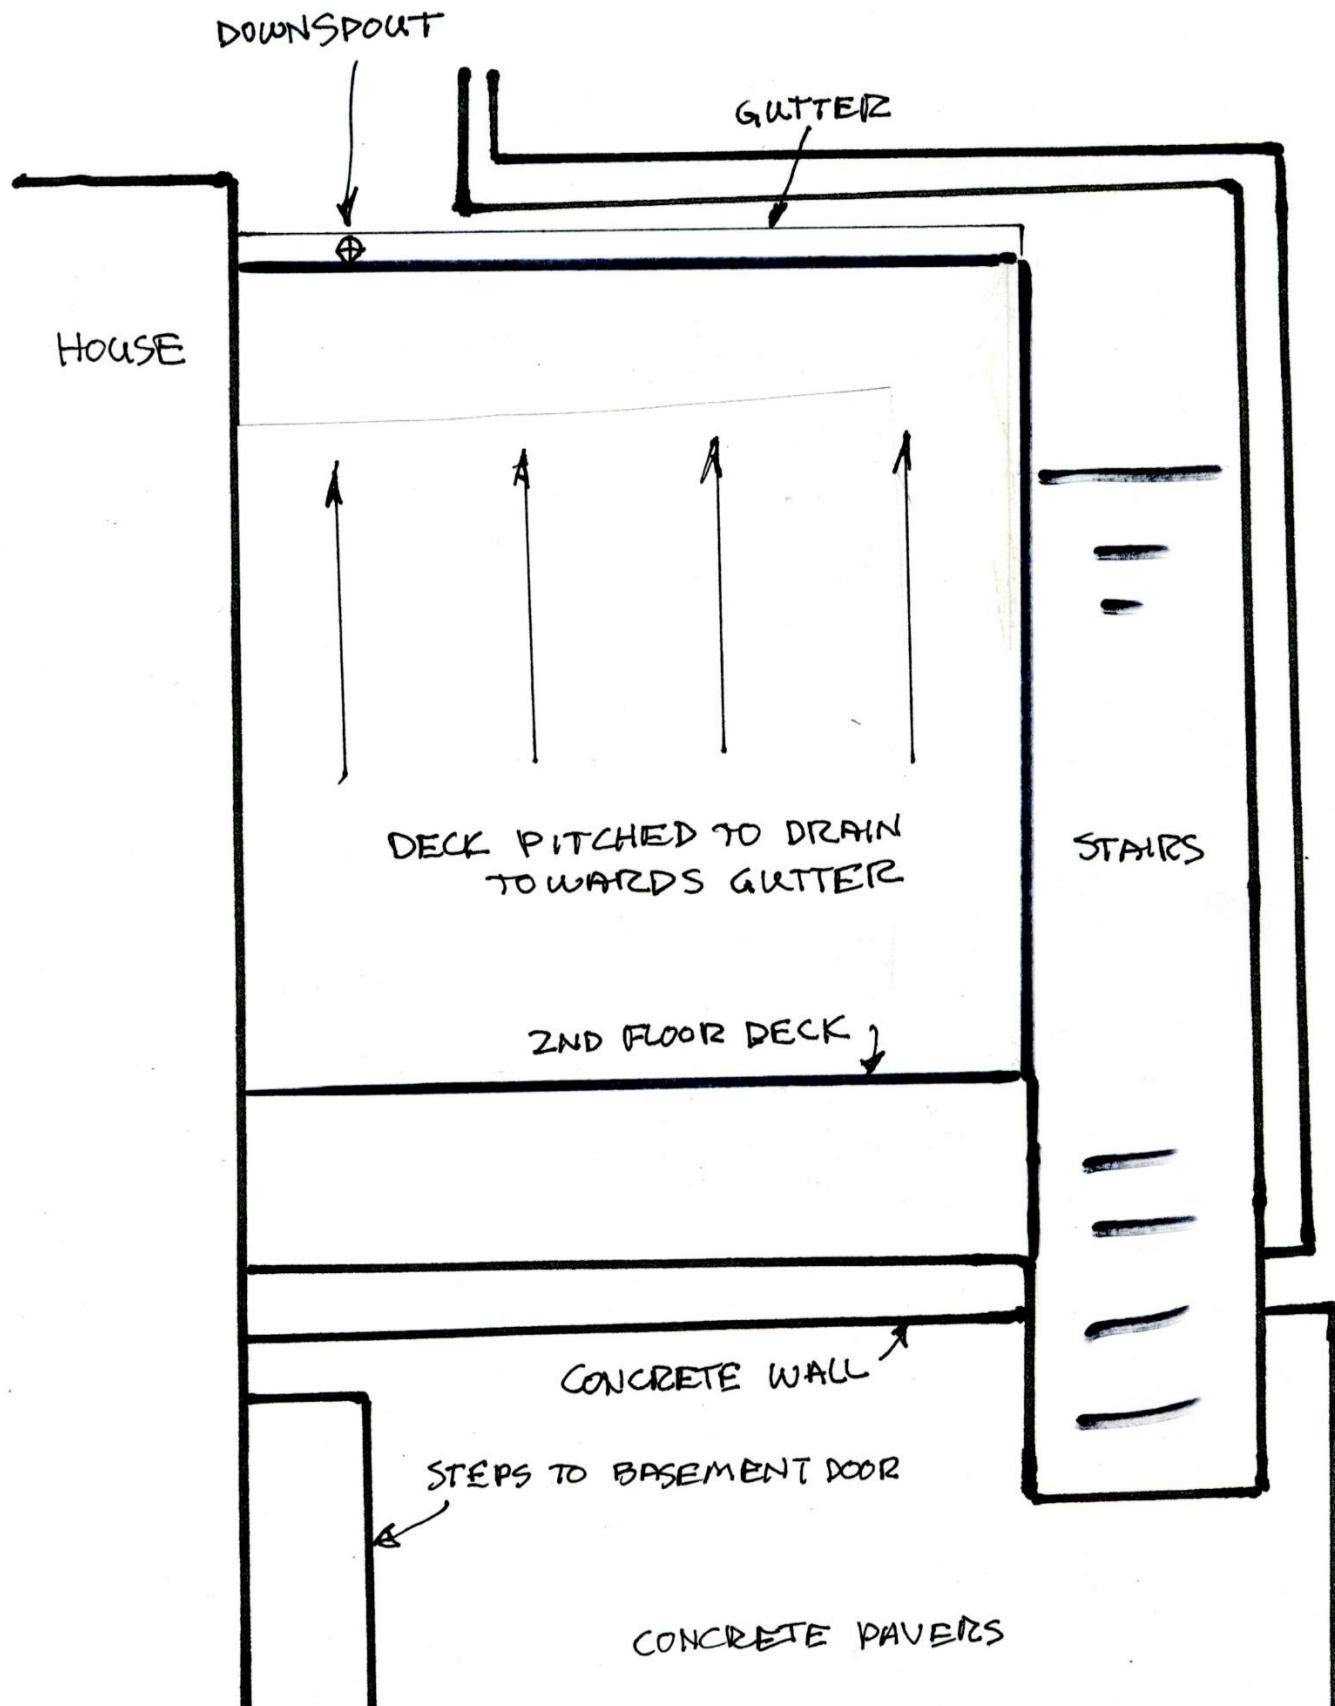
Second floor roof deck with indicated pitch and gutter/downspout location.
